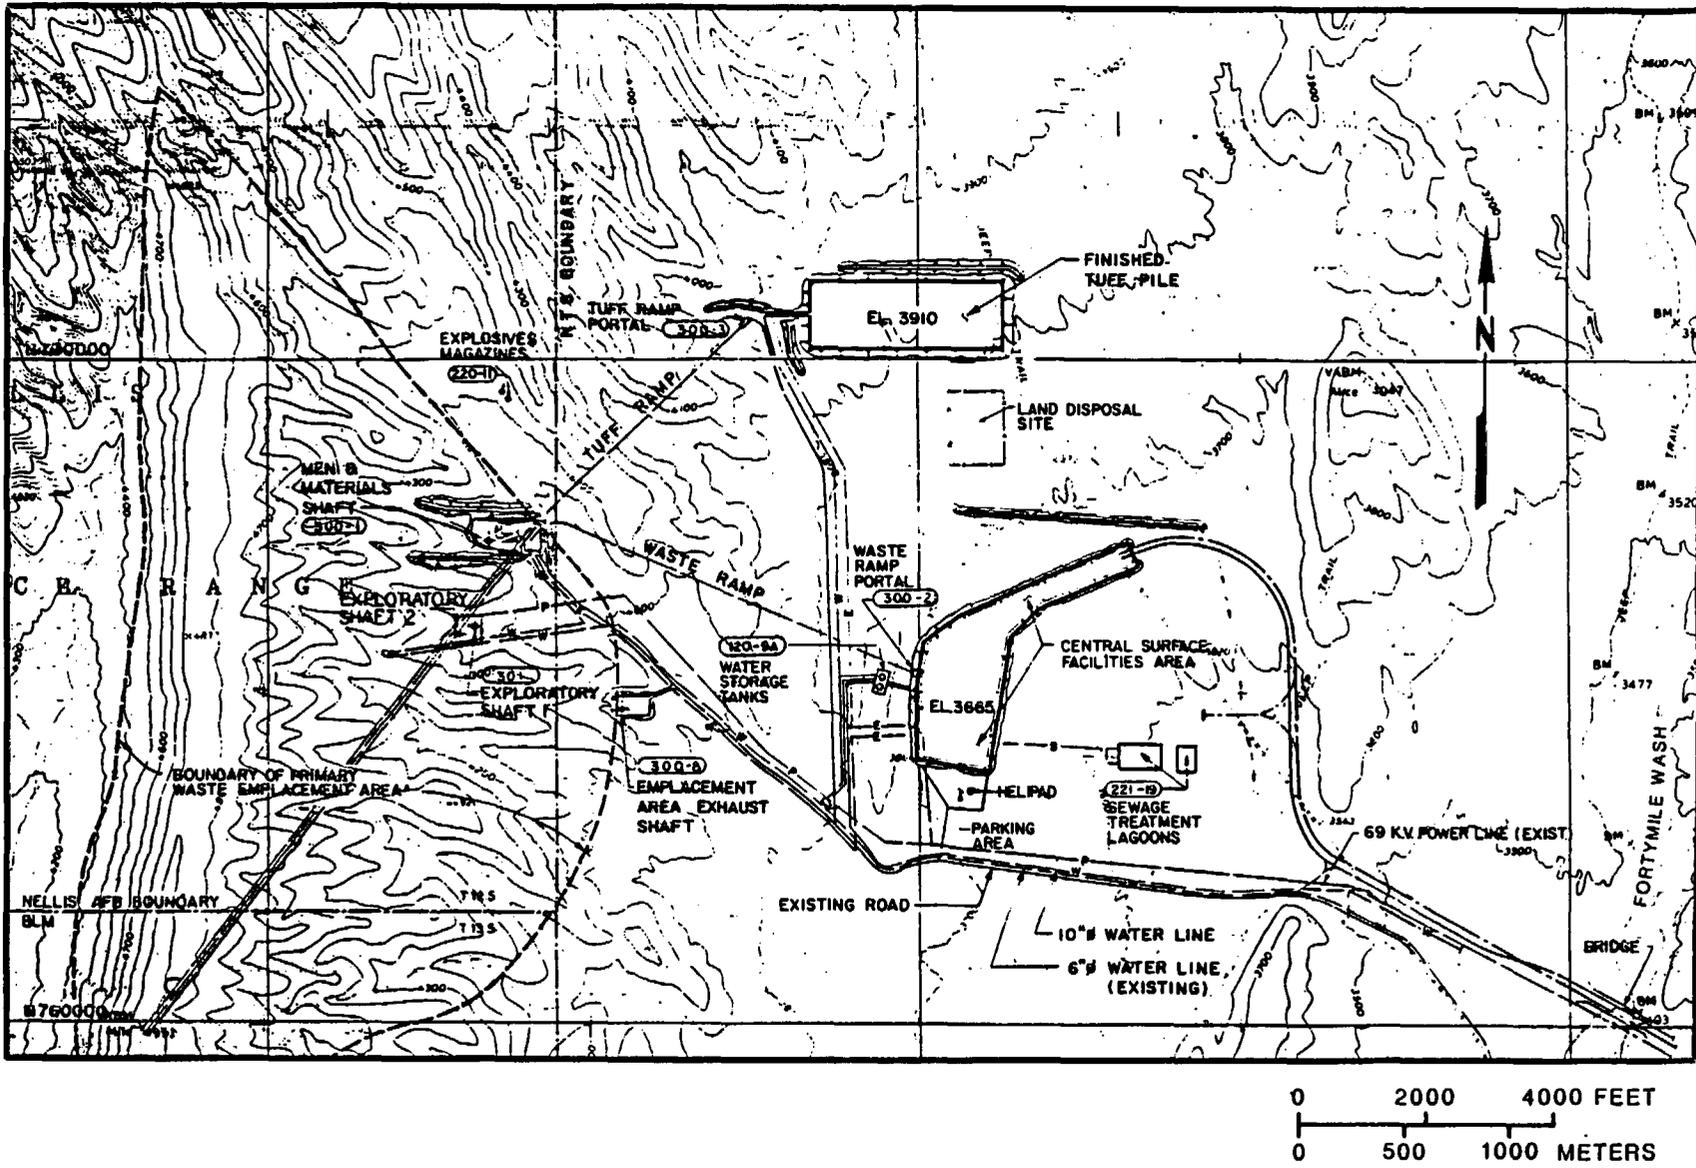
Site characterization plan-conceptual design overall site plan.
